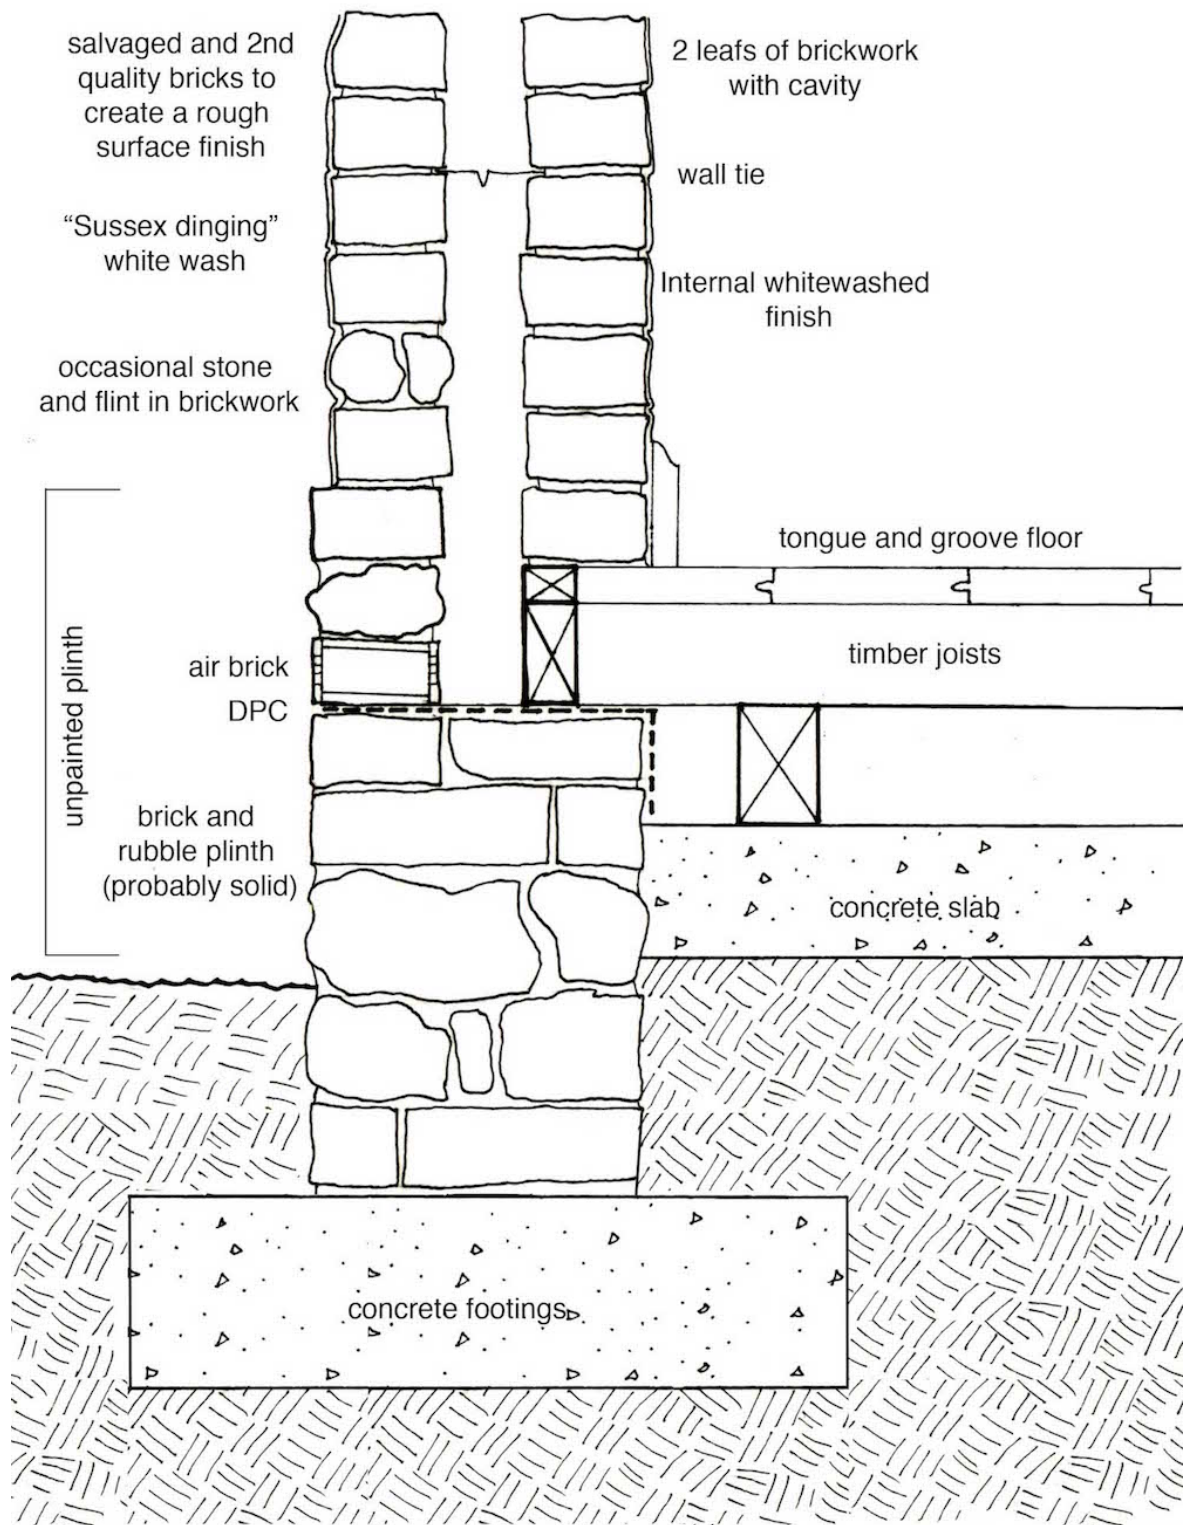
wall, footings and floor diagram NTS (Anderson 2018e)
